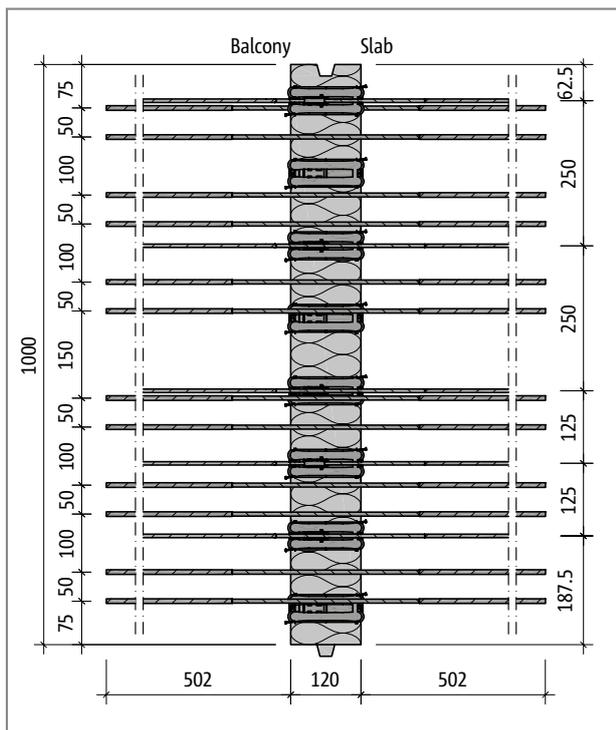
Schöck Isokorb® XT type K-M4: Product plan view
